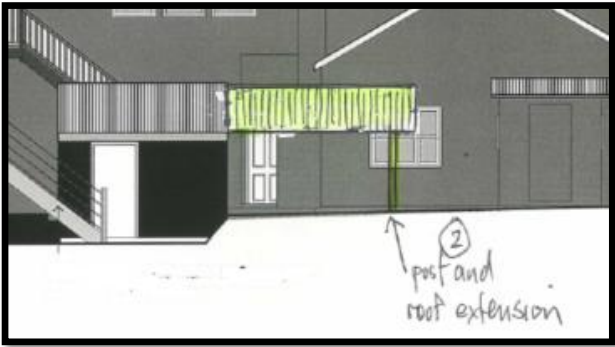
Proposed works – roof extension to brick store 4m x 3m
